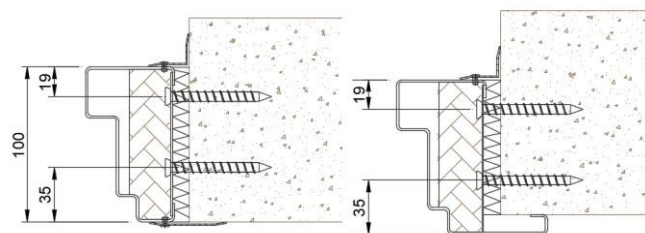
Installation of the door into the structural opening SMU110/210; SMU106/206; SMU107/207
